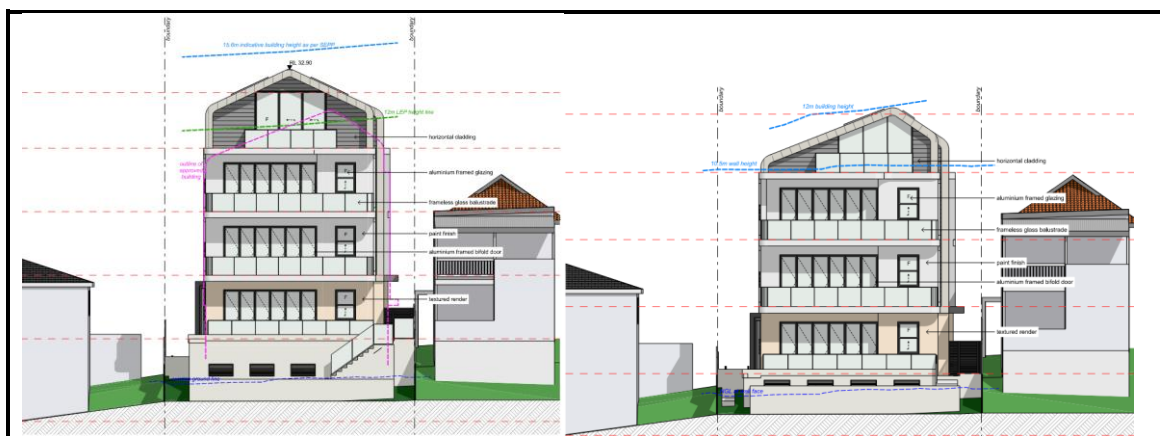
Rear eastern elevation showing at left the proposed and at right the approved noting image at left shows the approved in pink dashed line (Source: Archispectrum)
